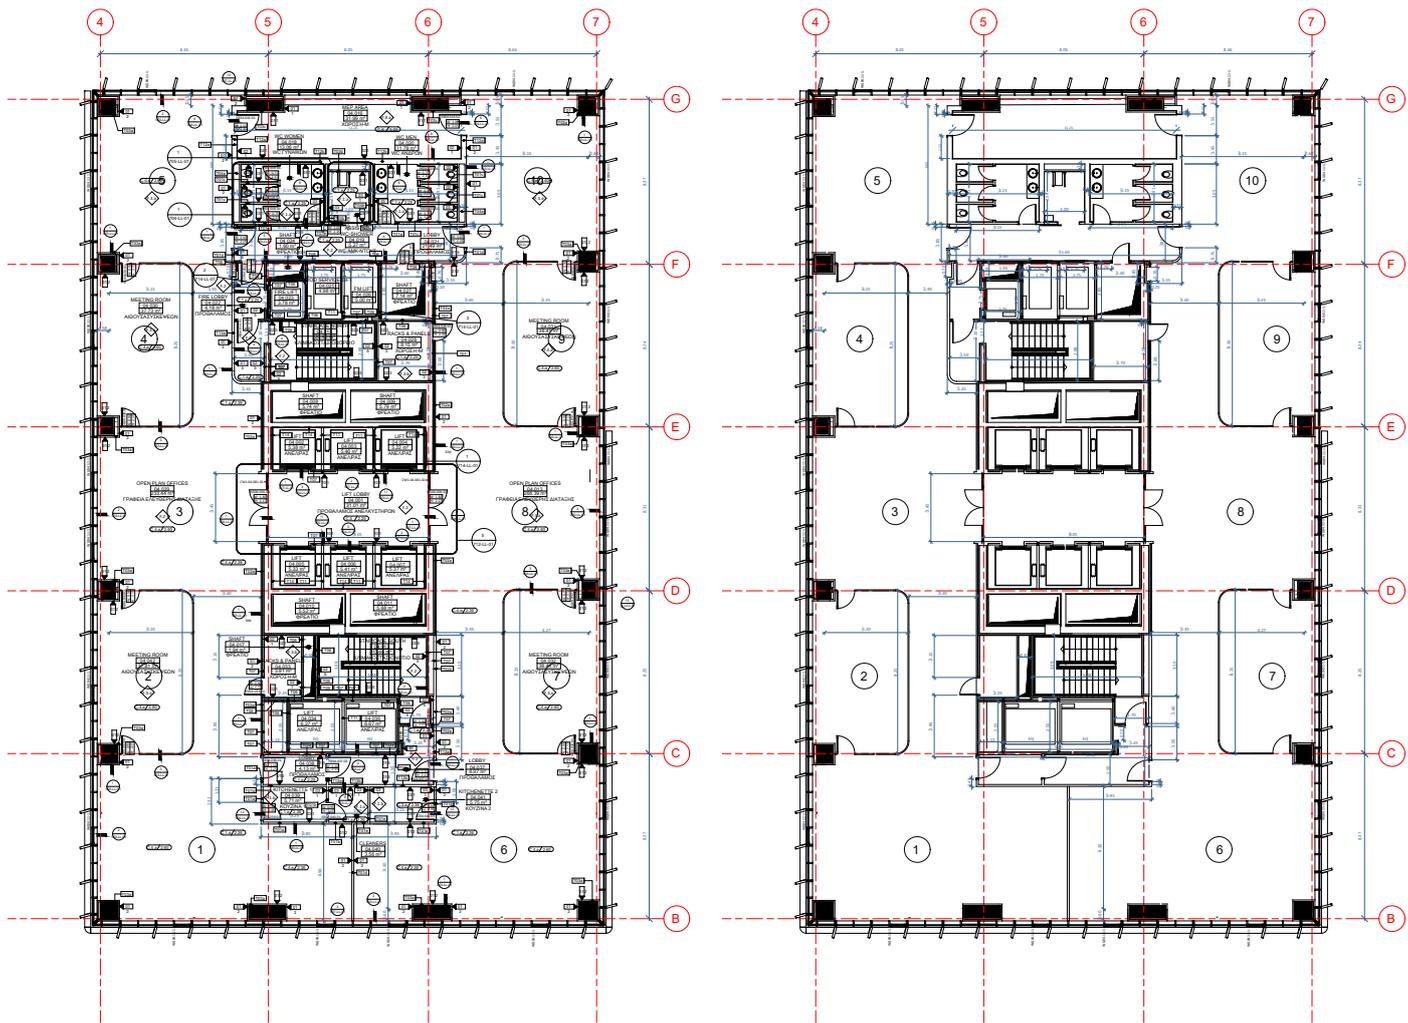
Piraeus Tower typical plan A (left) and B (right)
